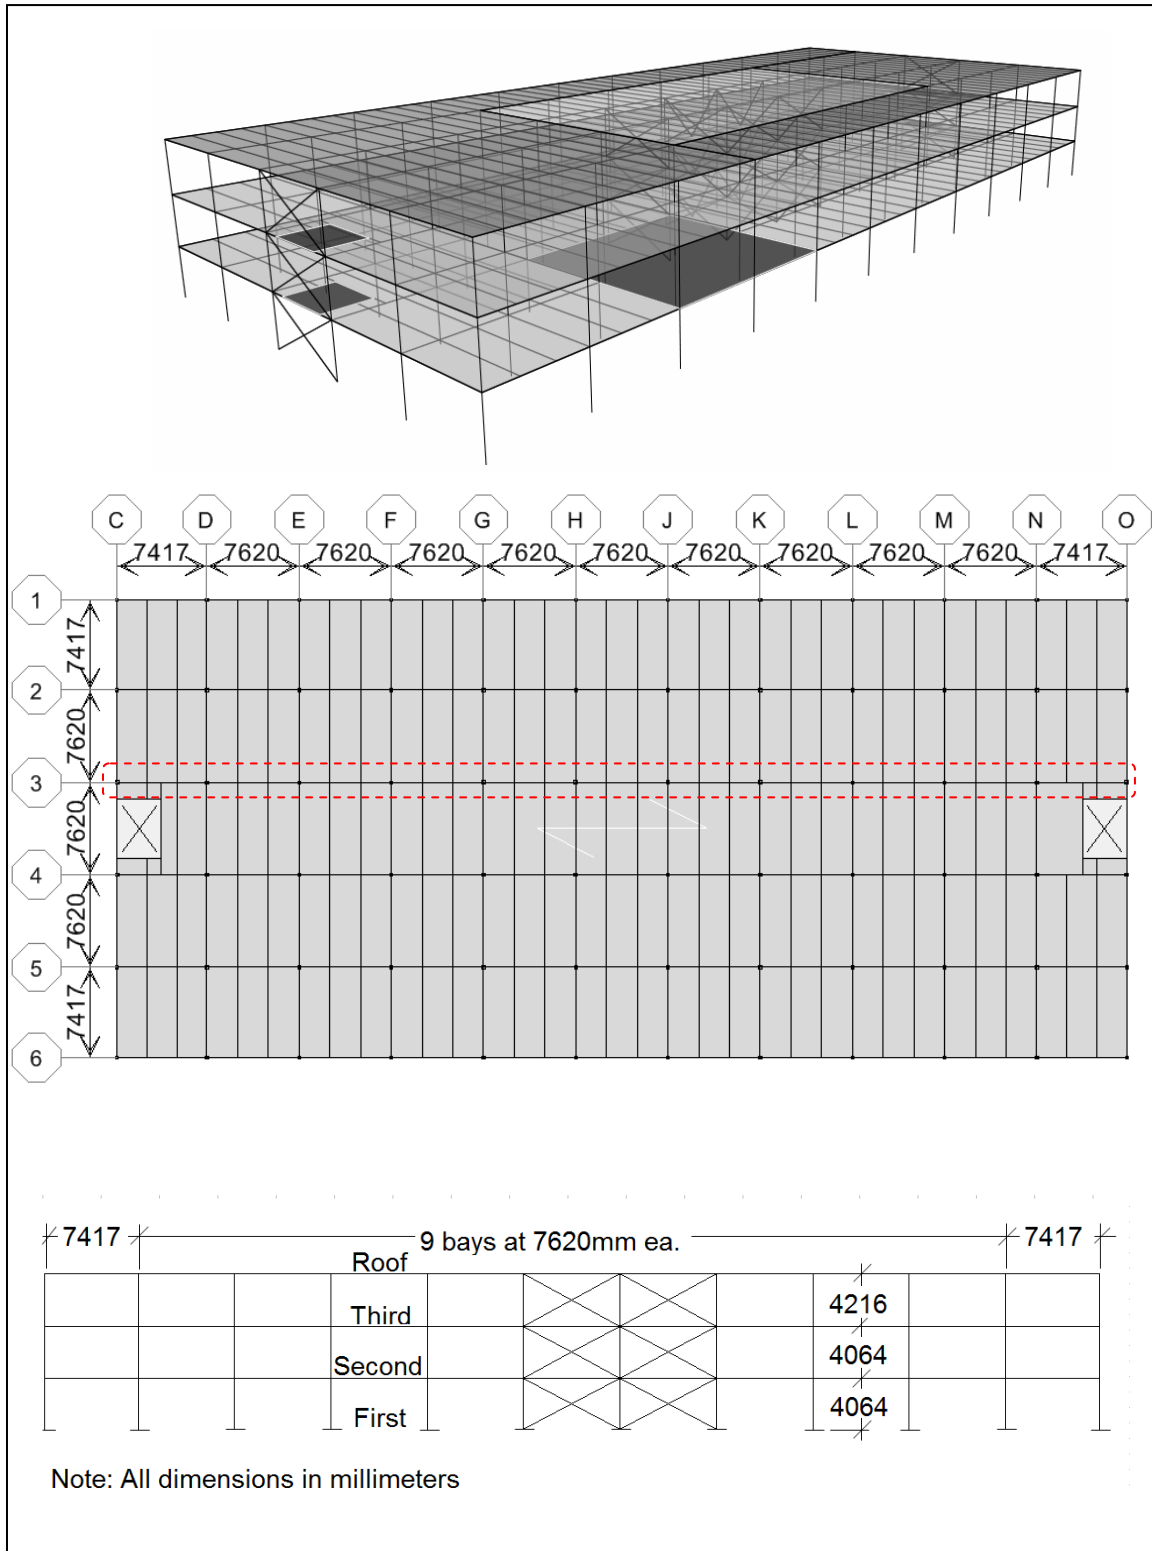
Building BF-3 3D, Plan and Section at Gridline 3
